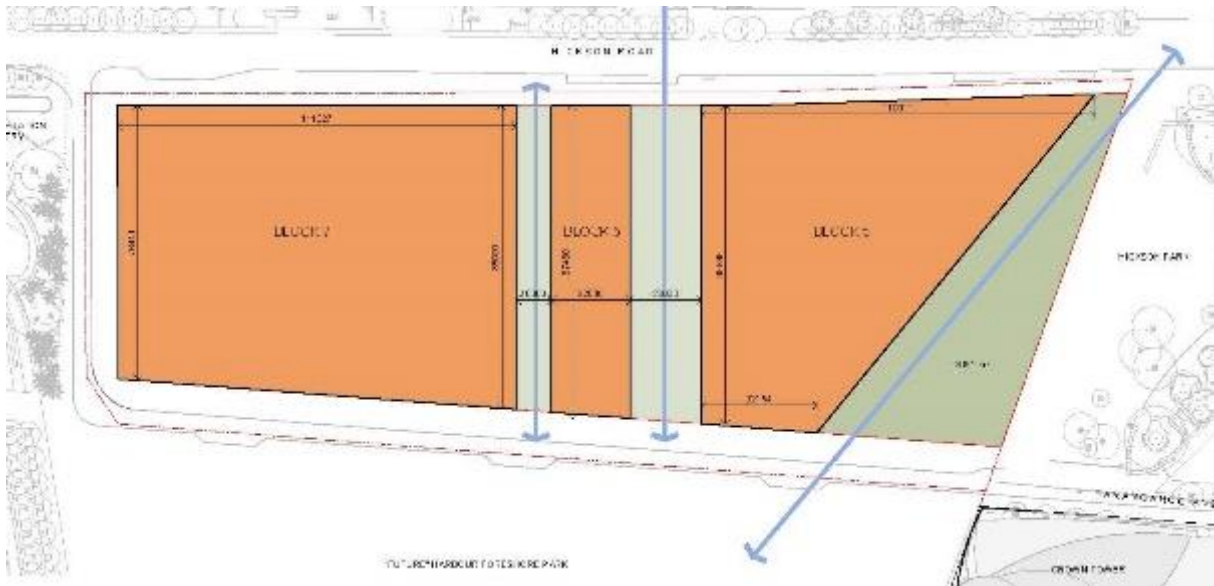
The approved concept plan building envelopes. (Source: SJB 2023)
